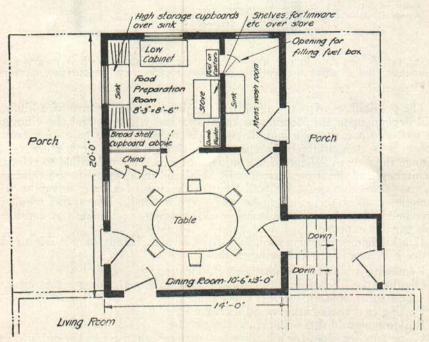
A plan similar to that shown in Fig. 13, with all equipment located in a small area used only for the preparation and serving of food. Note the addition to accommodate stairs to the basement. Stairs may be built directly above these to reach the second floor.
